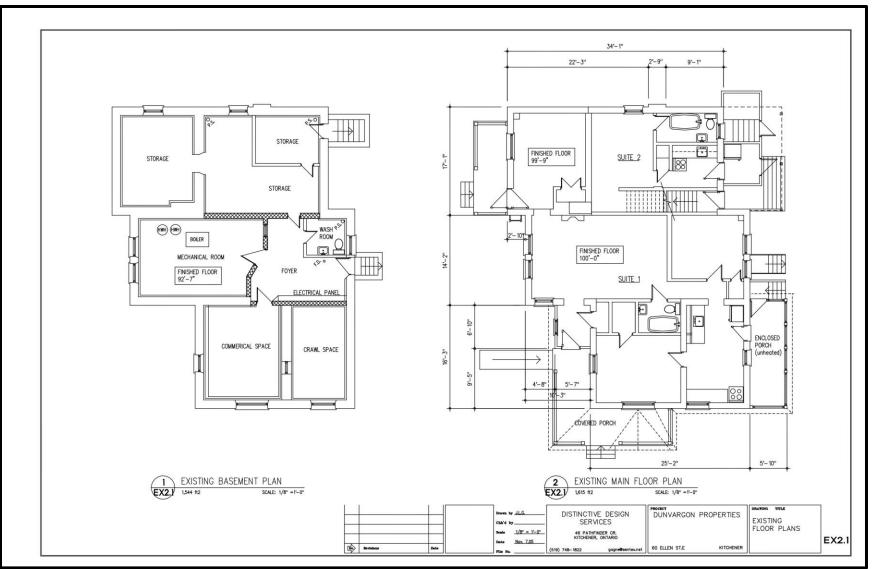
Existing Basement and Main Floor Plan (Distinctive Design Services 2005)
